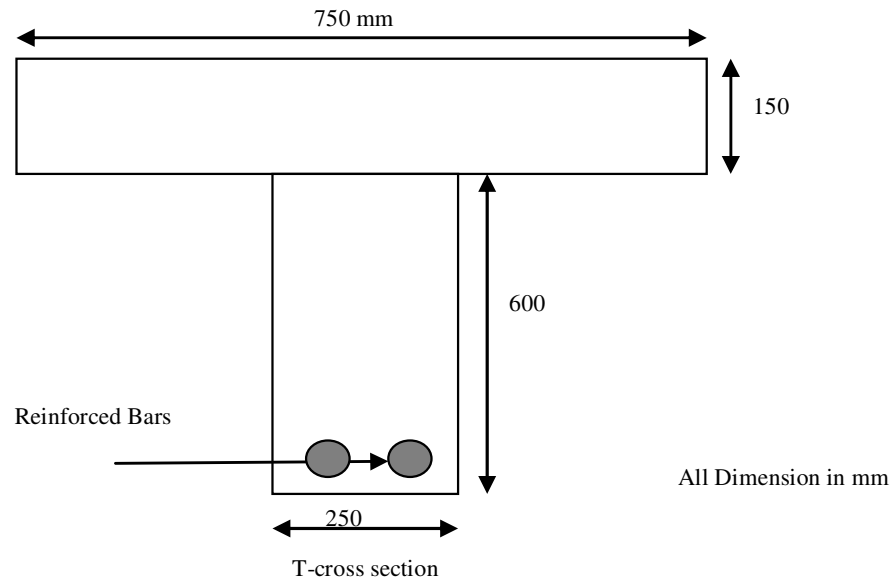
Cross –sectional dimensions of reinforced concrete bridge girder.
